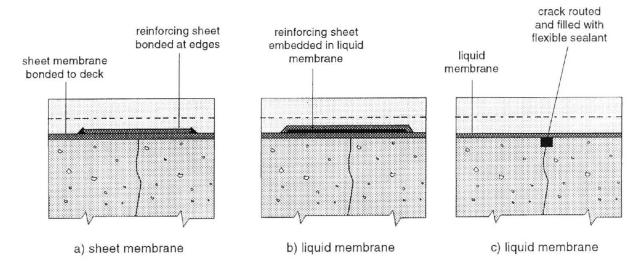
Waterproofing details at active cracks and construction joints.
